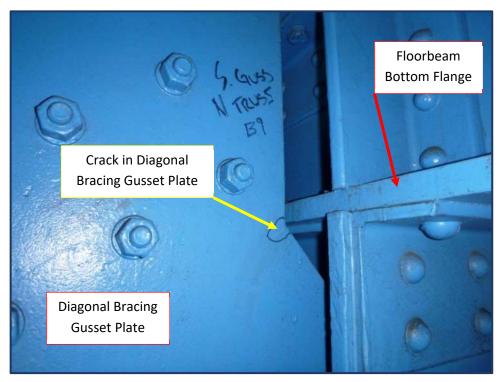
Crack in Diagonal Bracing Gusset Plate, Unit III, Floorbeam 9, North Column
